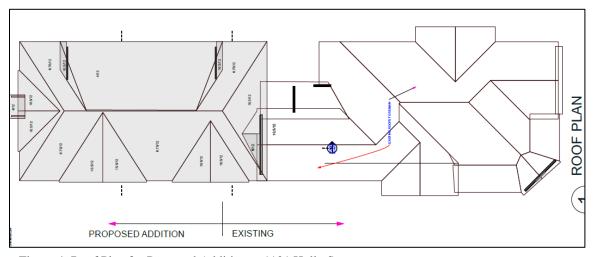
Roof Plan for Proposed Addition at 1101 Holly Street.
